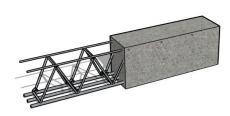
Design of Reinforced Concrete Beam Specimen with Frame System and Single Compression Reinforcement (STR T25)
